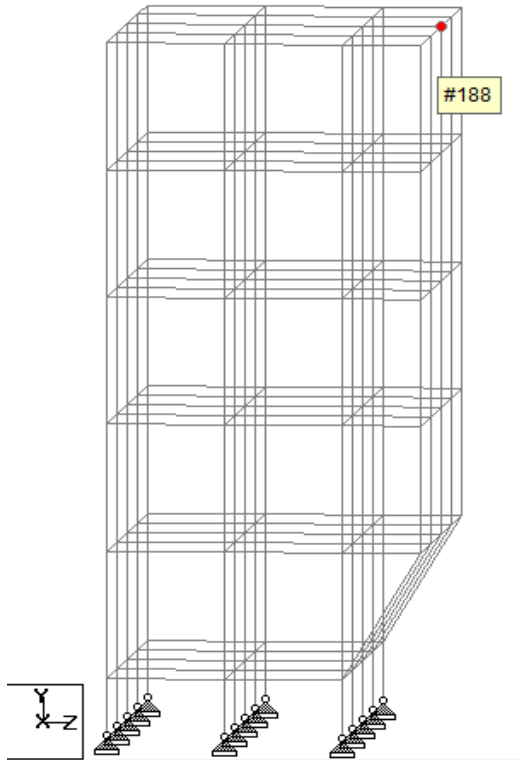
Building Model with overhanging beams with floating columns with Bracket below
